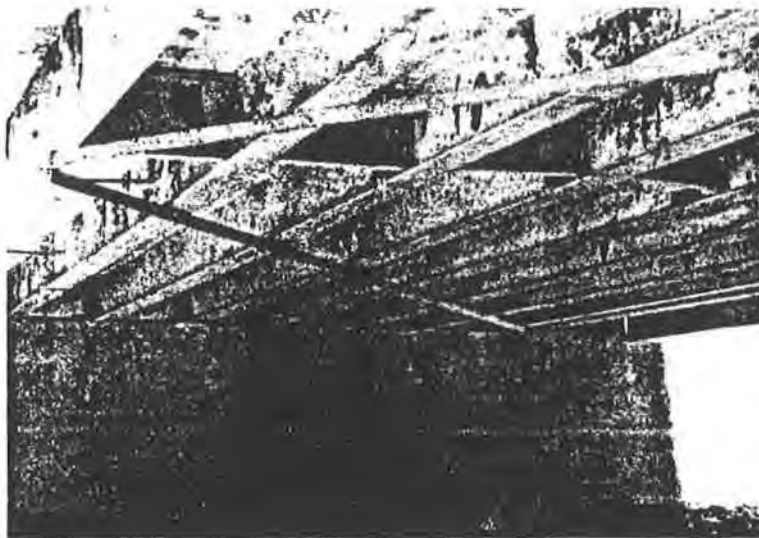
Rusting on Steel Stringer Bridge [16].
